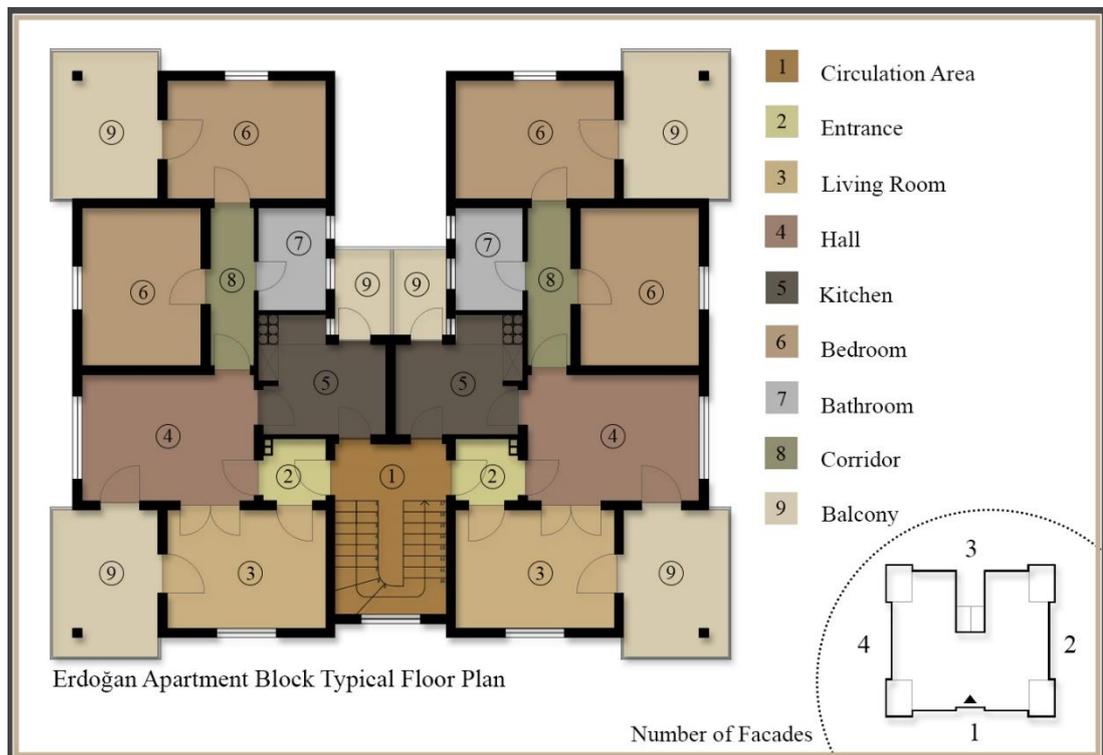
Erdoğan Apartment Block floor plan and functions. Drawn and produced by the author.
